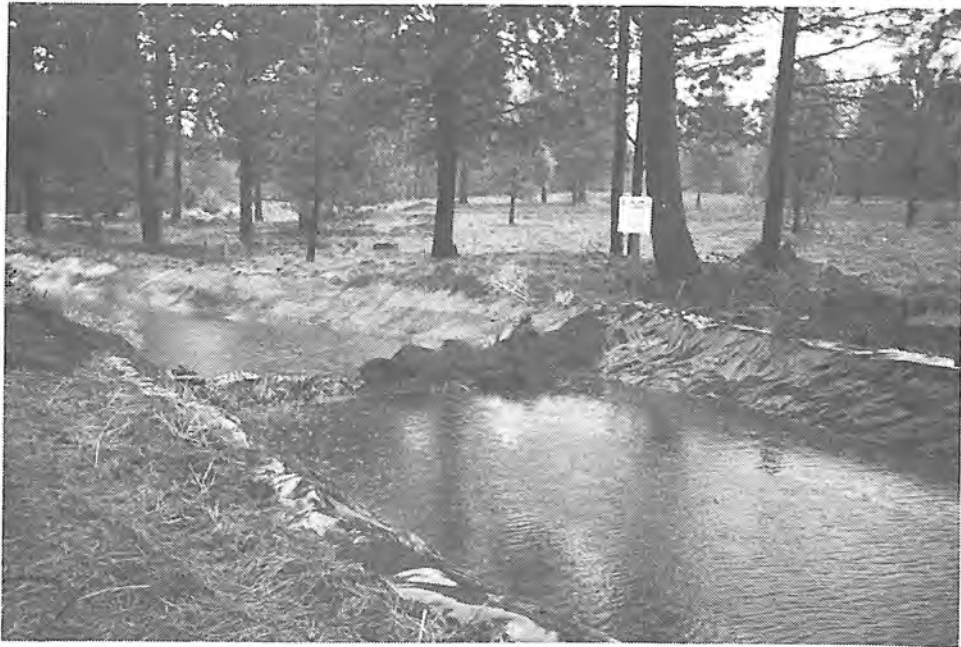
Typical dike construction for ponding tests over installed materials.
